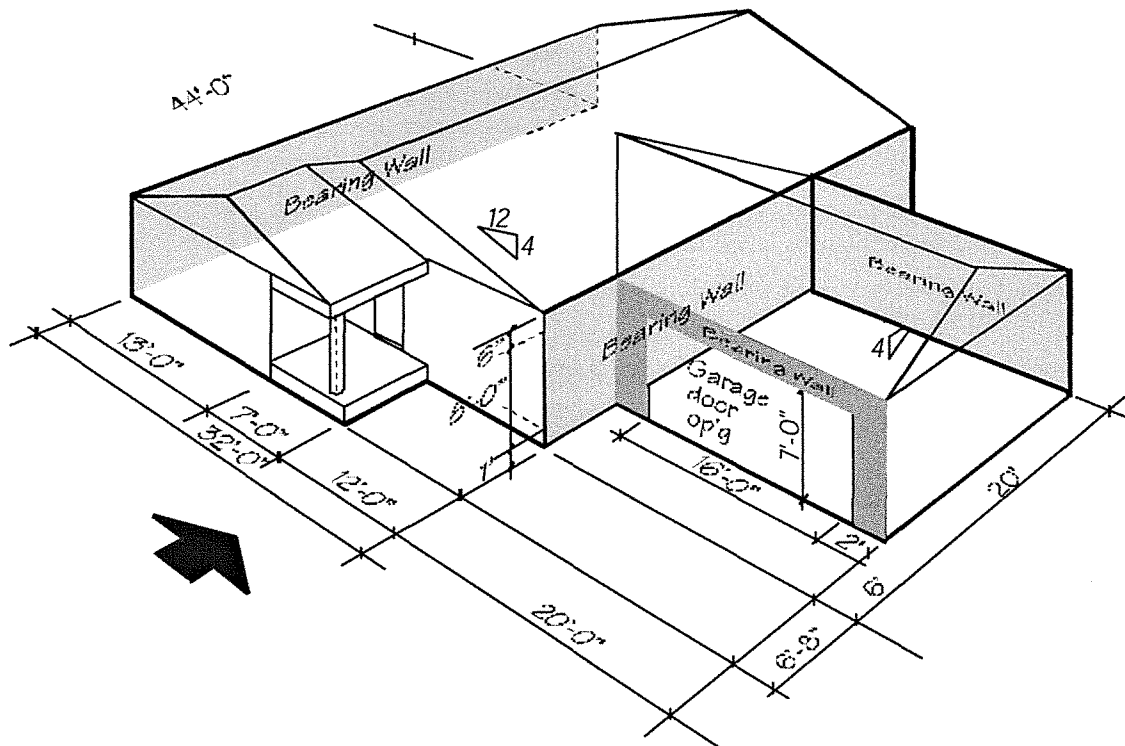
Perspective of One Story Residence Bearing Walls Highlighted
